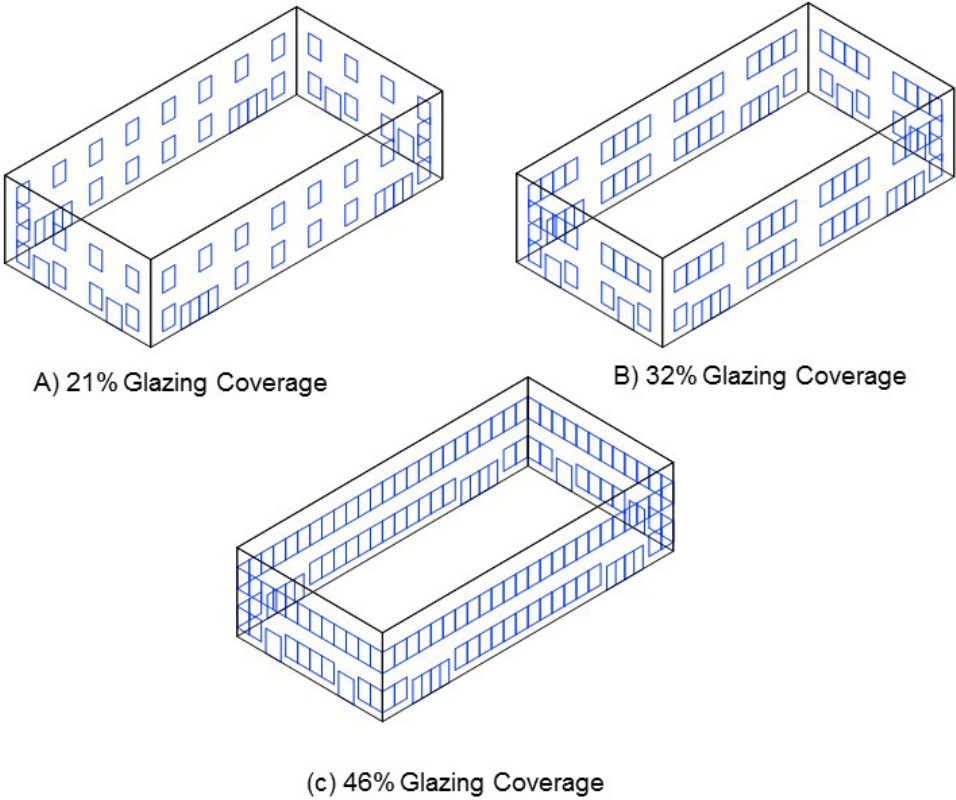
Modeled Two-Story Fully-Engineered Buildings
